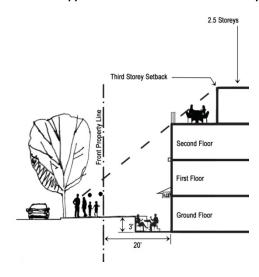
Illustration of upper floor setback for flat or shallow pitched roofs (NEW DIAGRAM)
